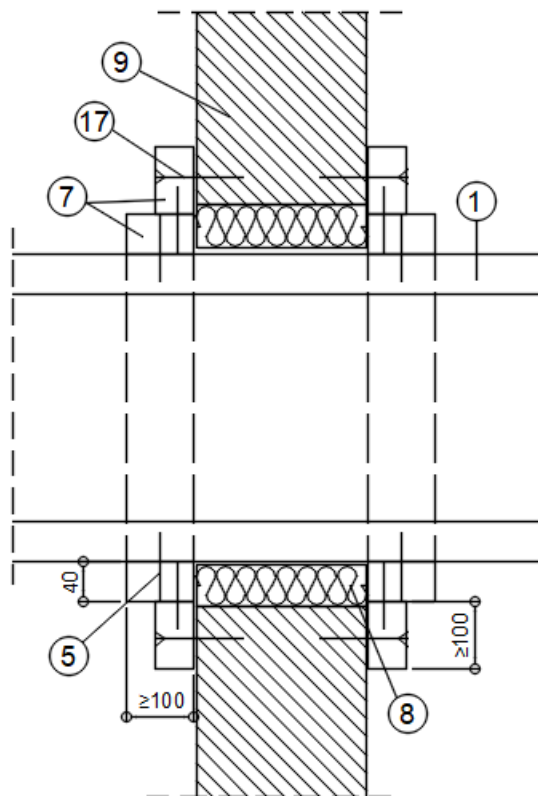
Self-supporting horizontal ventilation ducts PROMADUCT®-LT – the penetration point through the rigid wall
